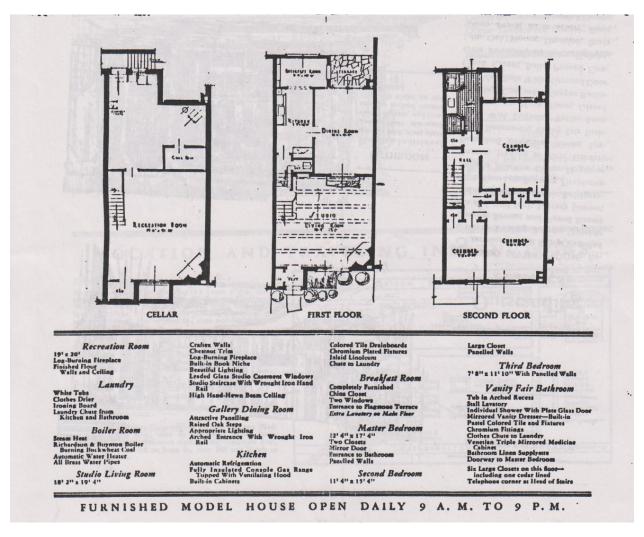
Stafford Lawns brochure showing floorplan (Rego-Forest Preservation Photo Collection 106).
